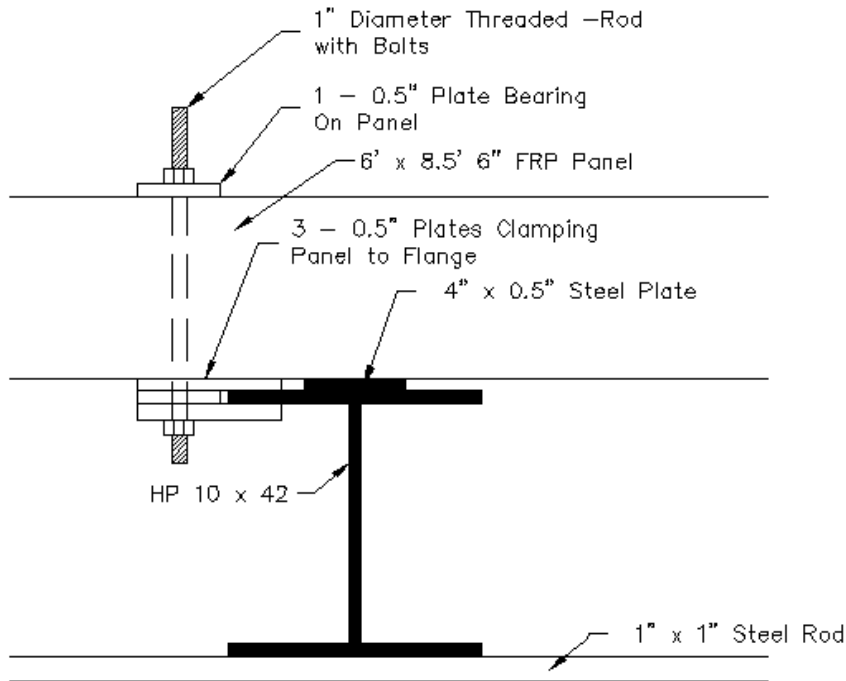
Connection Detail - FRP Deck to Steel Beam Connection
